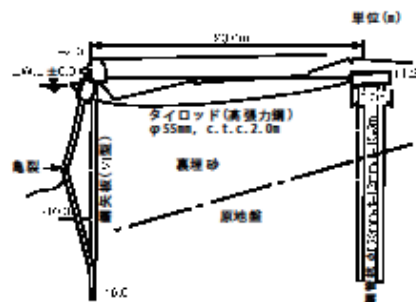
Damage to a sheet pile quay wall at Ohama Wharf, Akita Port
